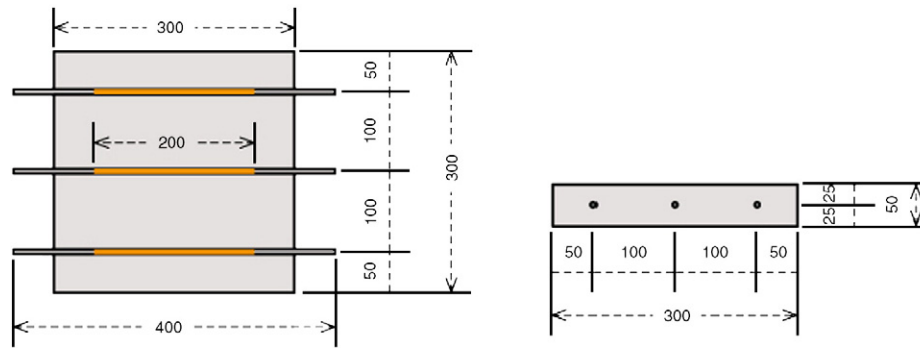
Design of the reinforced concrete slabs (dimensions in mm).
